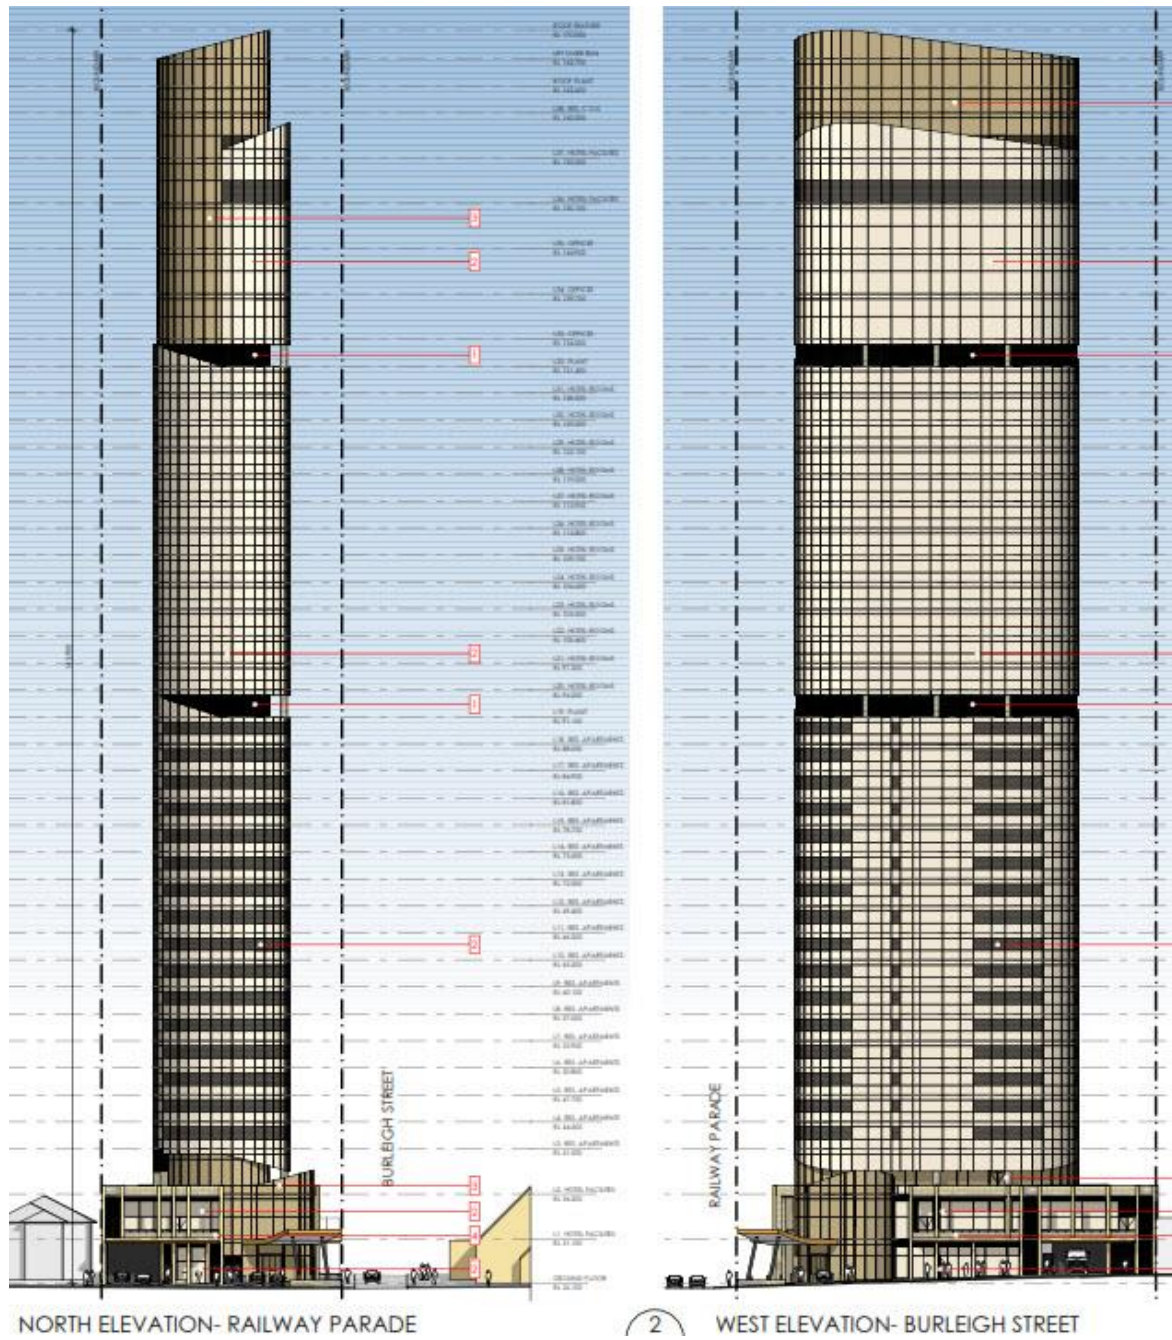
Proposed Street Elevations on Railway Parade and Burleigh Street.
